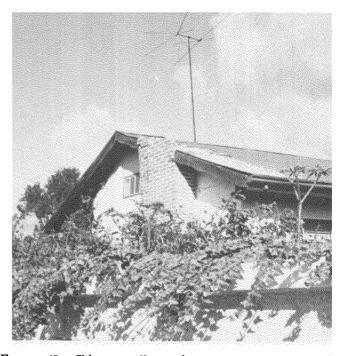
Chimney collapse from a one-story house in Guatemala City, Zone 11.
